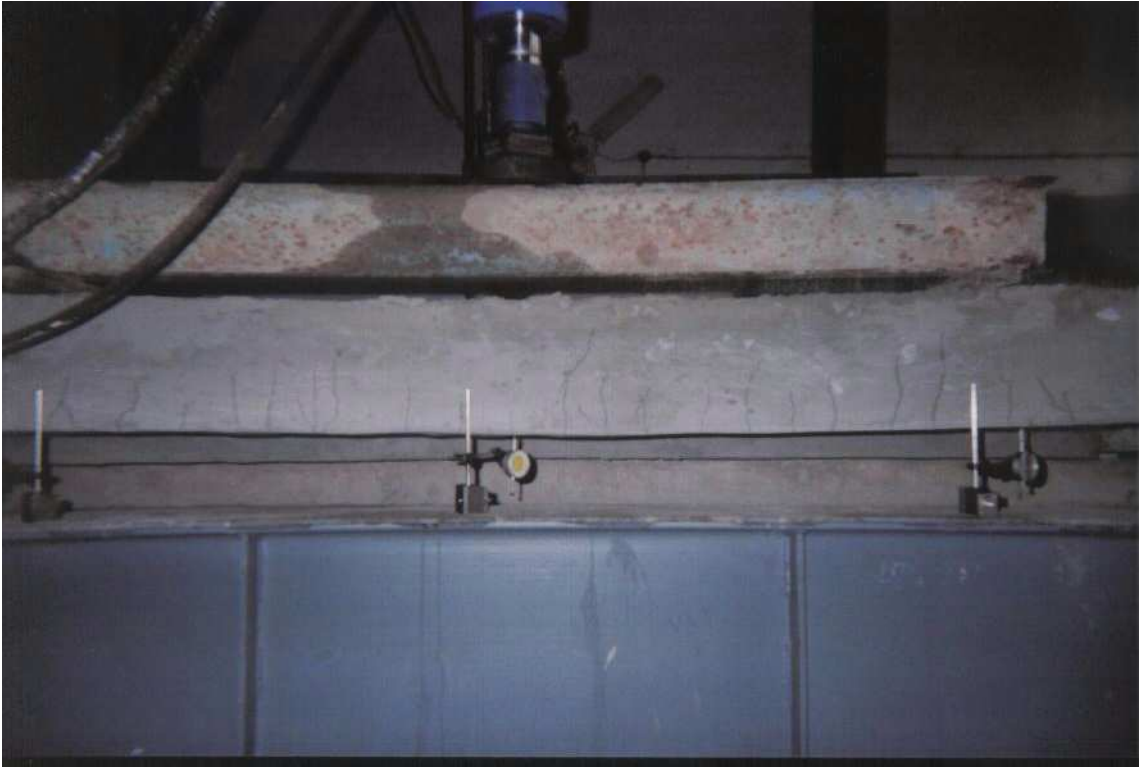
SPECIMEN R1 (60 % STRESSED)
